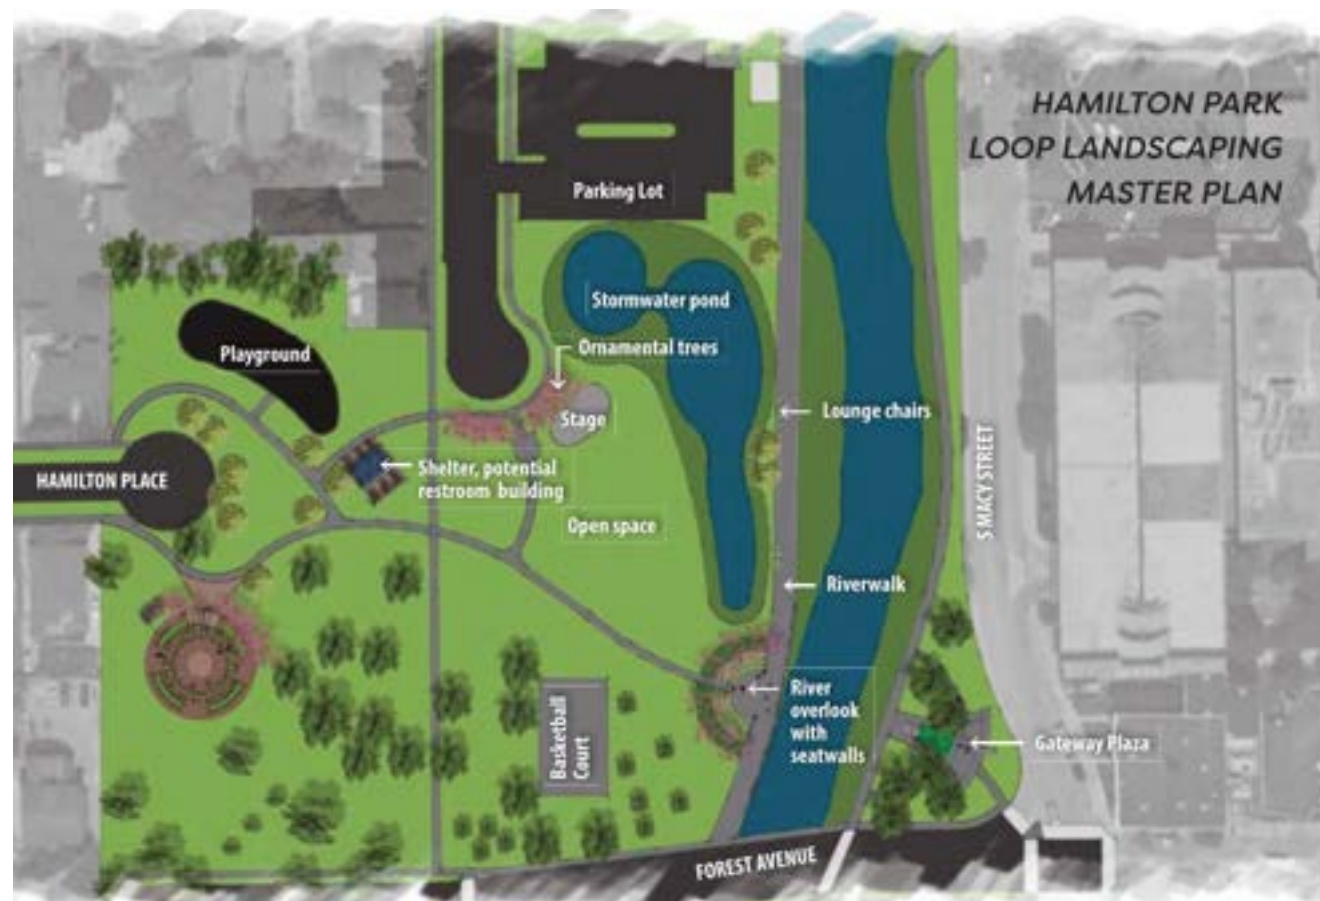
Fond du Lac Loop Master Plan - Hamilton Park
